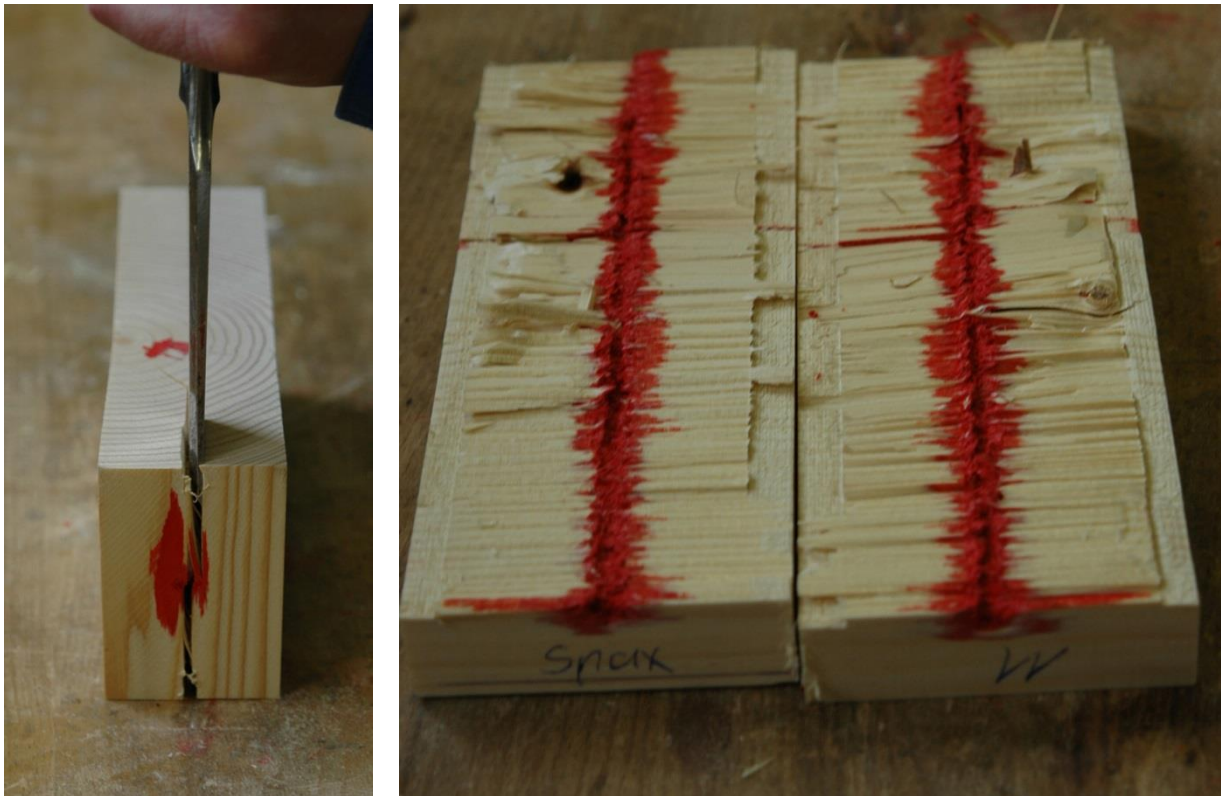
Opening of the specimens (left) and opened specimens (right).
